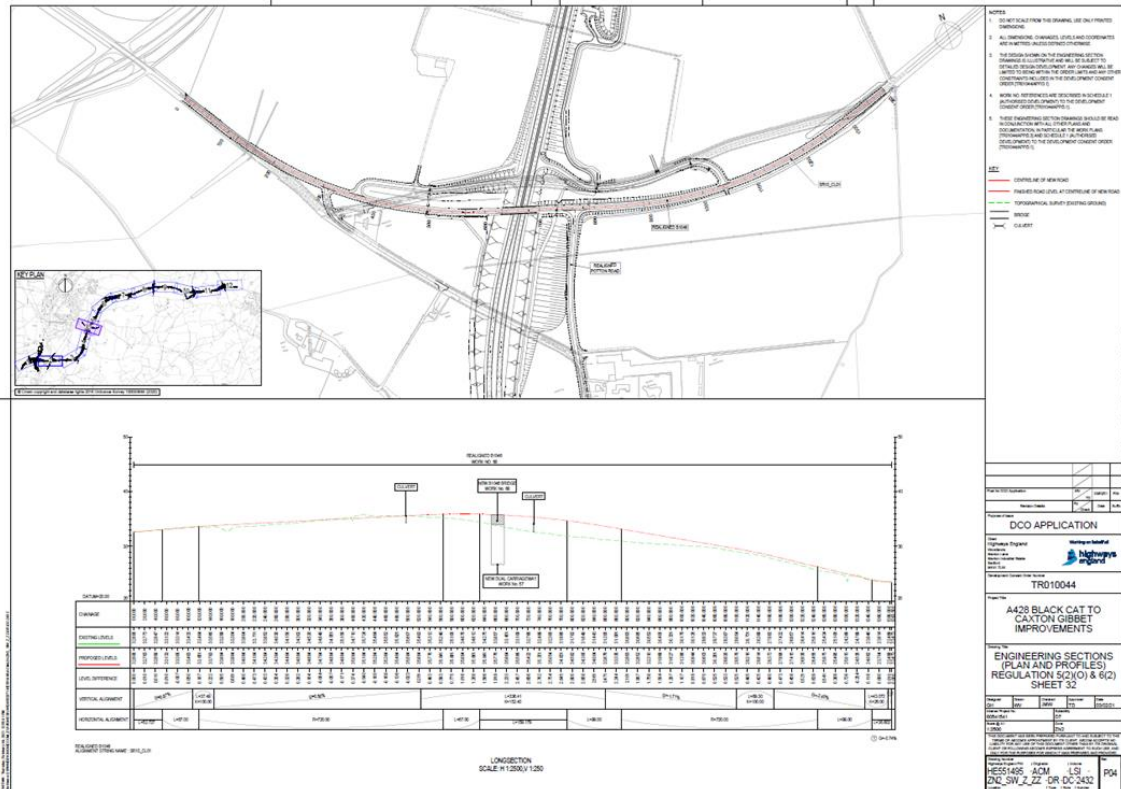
Applicant's General Arrangement and Longitudinal Section of B1046 and Potton Road Realignment [Extracted from APP-021]
